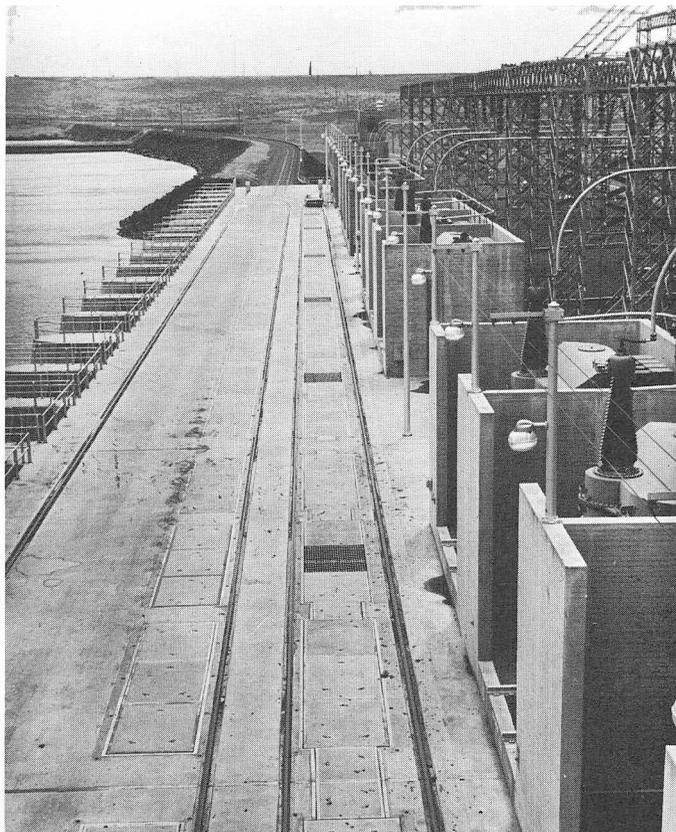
Concrete slab and steel grill on intake gatewells at McNary Dam.
